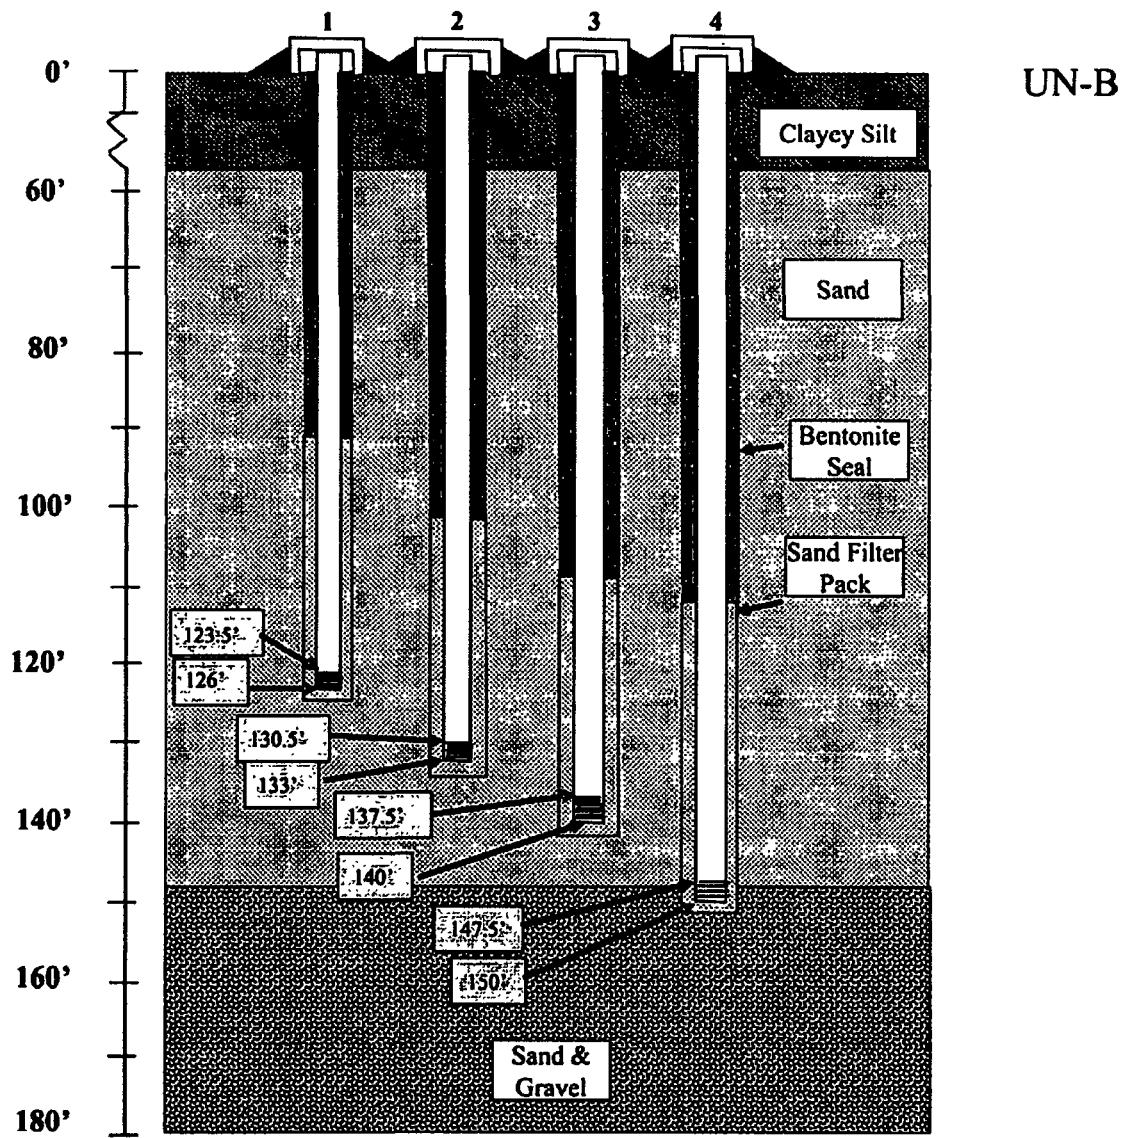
UN-B-1, UN-B-2, UN-B-3 and UN-B-4 construction details. Installed in February 1997 by Liehs Drilling Inc., Lexington, NE using a hollow stem auger.
